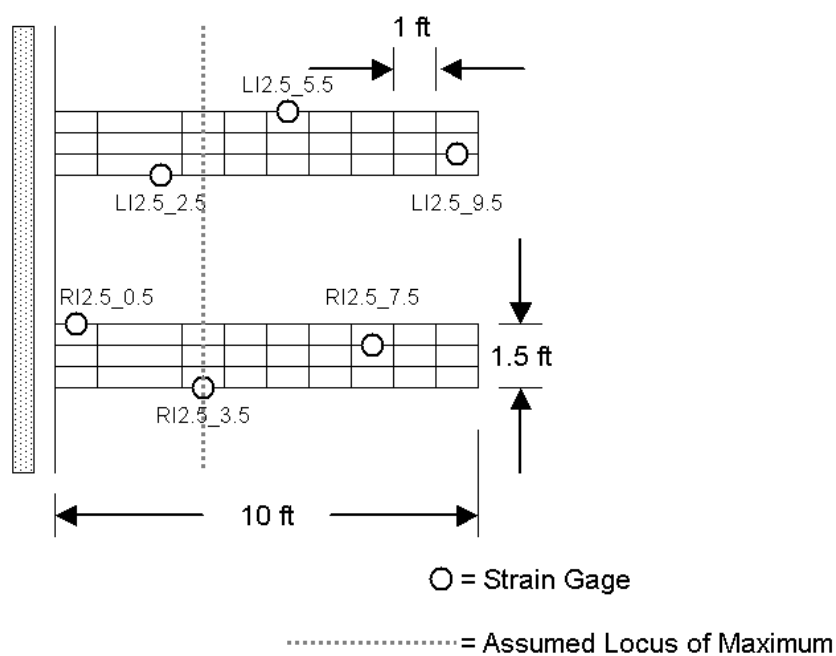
Plan view of instrumented intermediate bar mat IL2.5 at level 2.5 located in the intermediate and primary reinforced section.
